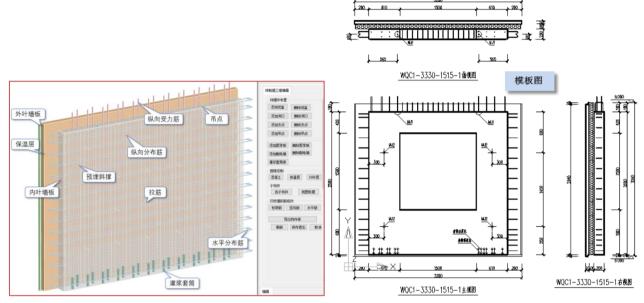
A sandwich prefabricated external wall (with an insulation layer which is larger than wall itself) in YJK's built-in prefabricated building design software (for national standard).
